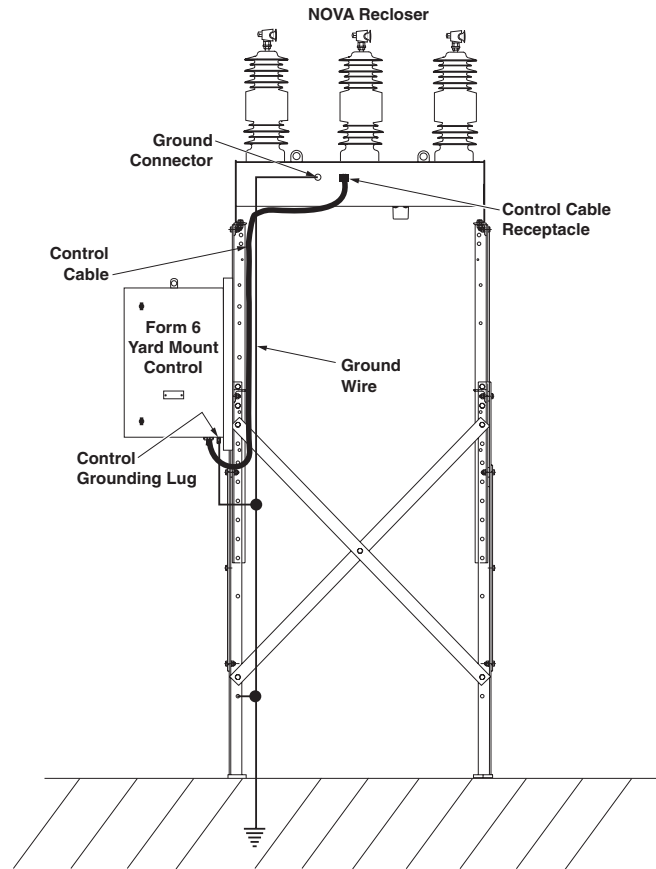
Grounding connections for a Form 6 yard mount control installed in a substation
